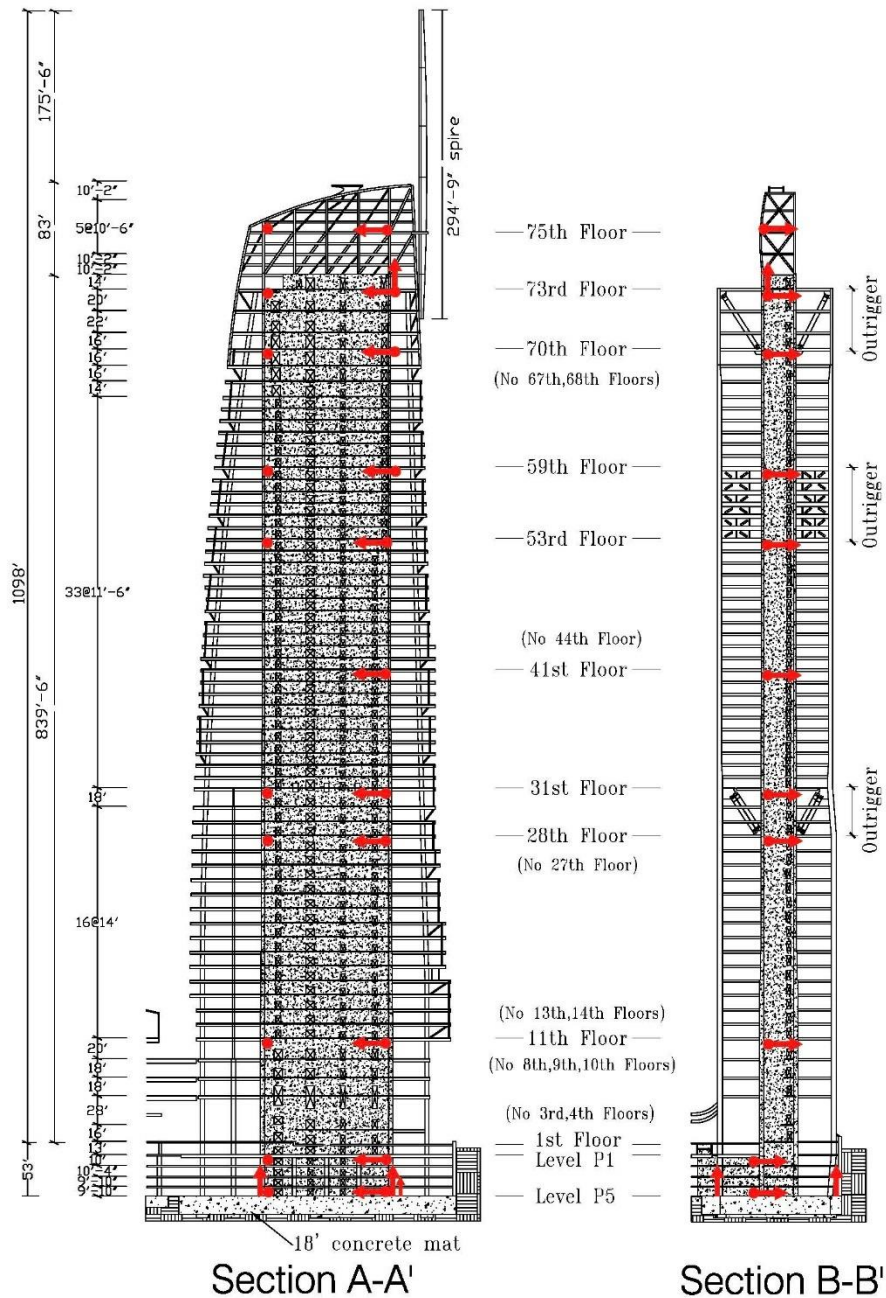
Section views showing the lateral force resisting system of Wilshire Grand Tower with concrete core walls and outriggers at three levels. The locations of the 36 sensors installed in the building are also shown. (Arrows indicate sensing direction; solid circles indicated out of the page.)
